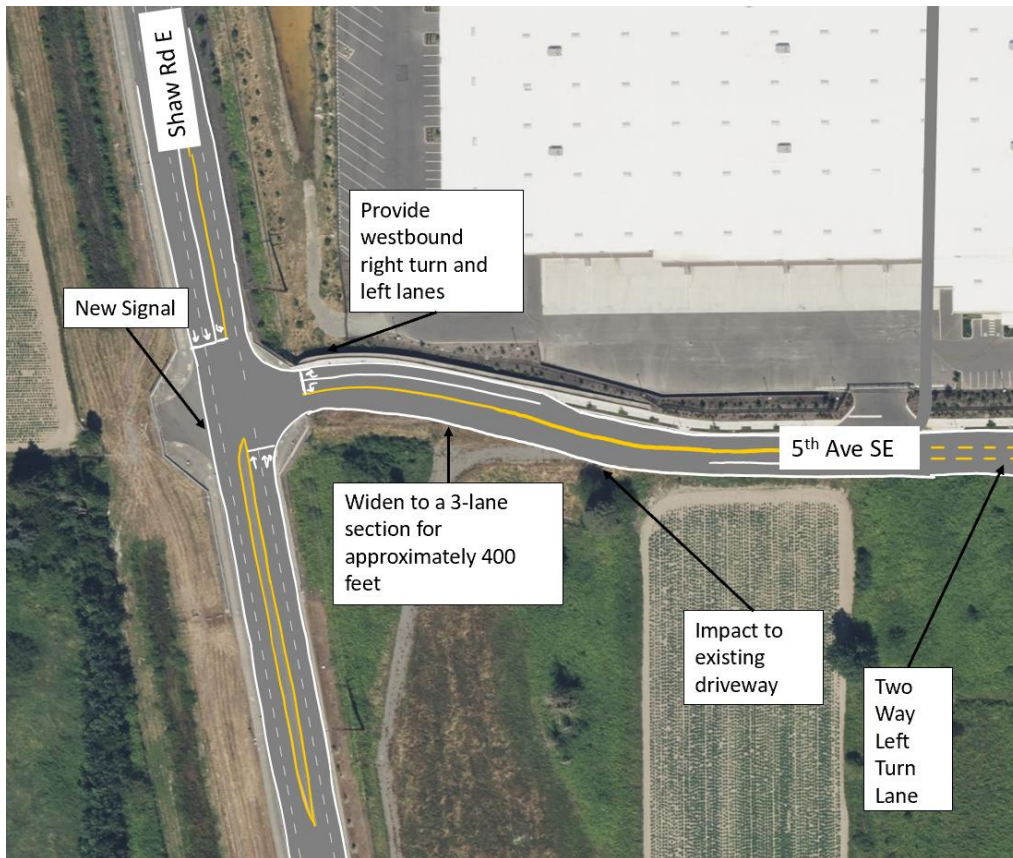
Mitigation Improvement at Location #28, Shaw Road E & 5th Avenue SE
